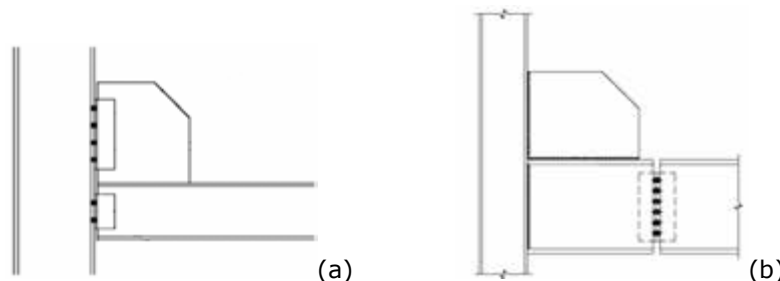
Beam-to-column connections that allow rotation: (a) Stoakes & Fahnestock [85], and (b) Thornton & Muir [86]
